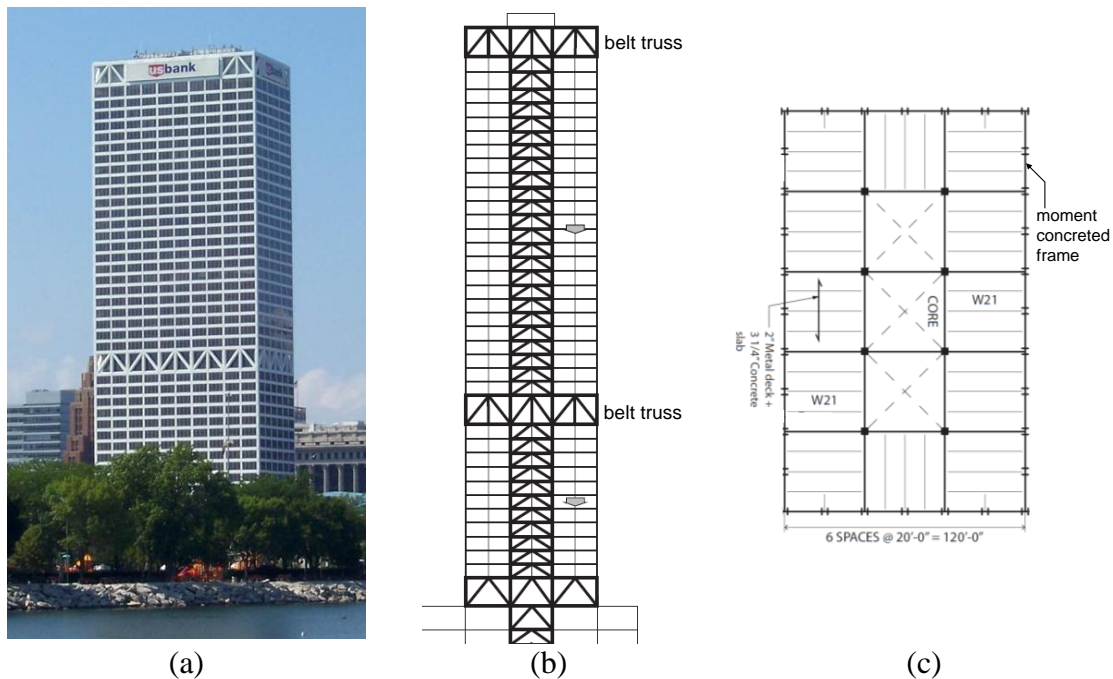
The (a) photo, (b) elevation, and (c) structural framing plan of U.S. Bank Center (source, (a):
